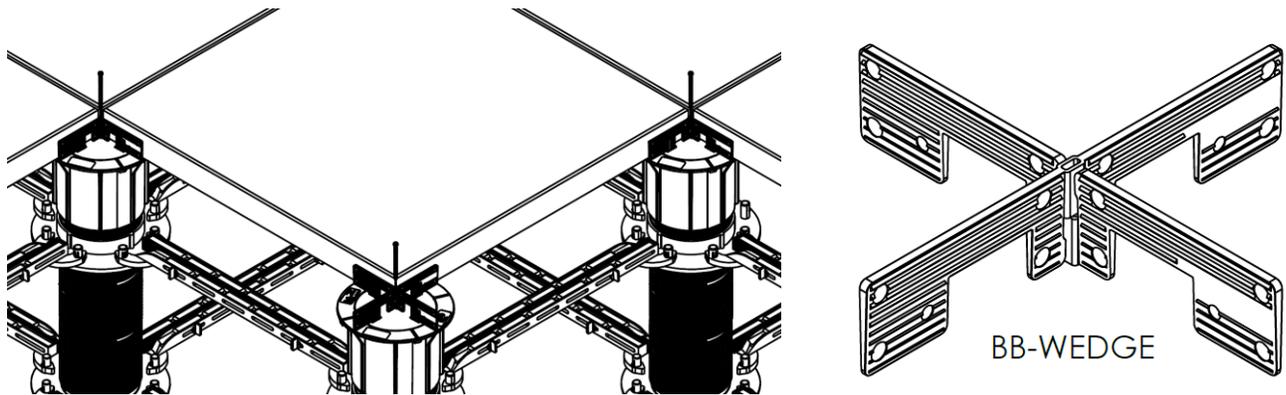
CONCRETE PAVER SEISMIC SYSTEM BB-WEDGE DETAIL
